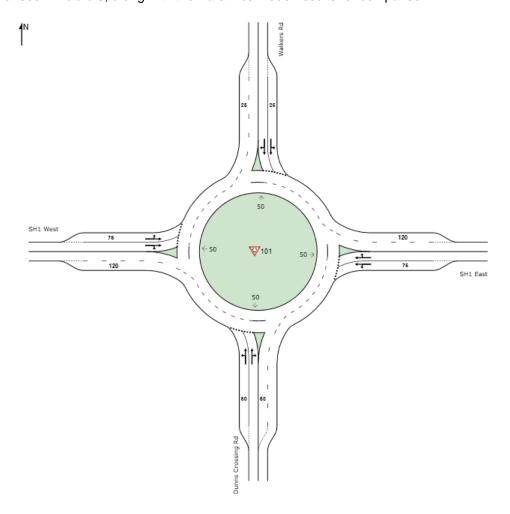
SH1 / Dunns Crossing Road / Walkers Road Assumed Layout
